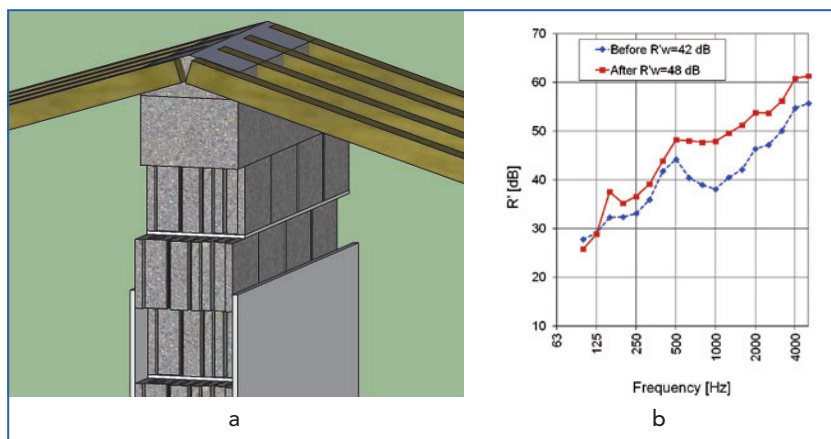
a) Example of a critical joint between the separating wall and the roof, b) Case study: airborne sound insulation of a wall before and after the filling of the cavities between the roof and the wall.
